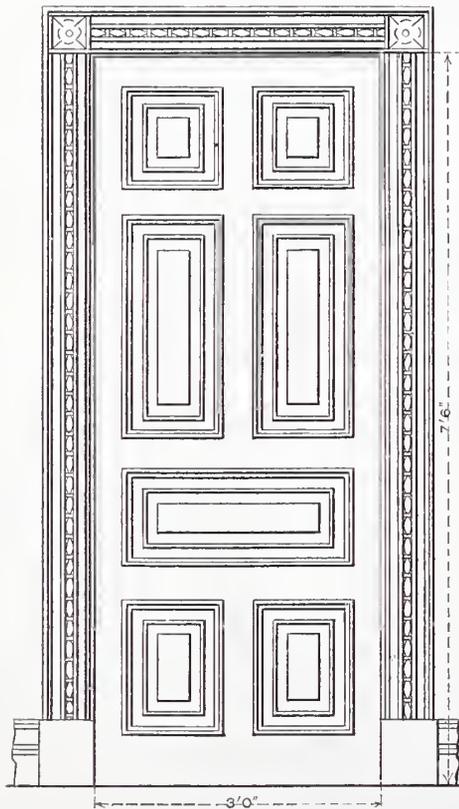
Detail of Doors in the First Story.—Scale, 1/2 Inch to the Foot.
